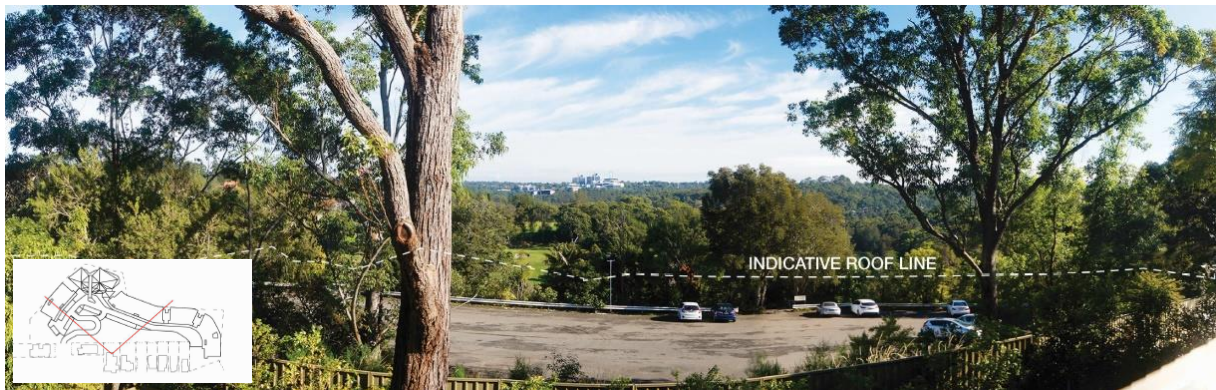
Visual impact assessment illustrating existing view from living room balcony to 29 Colwell Crescent. Source – Marchese Partners
